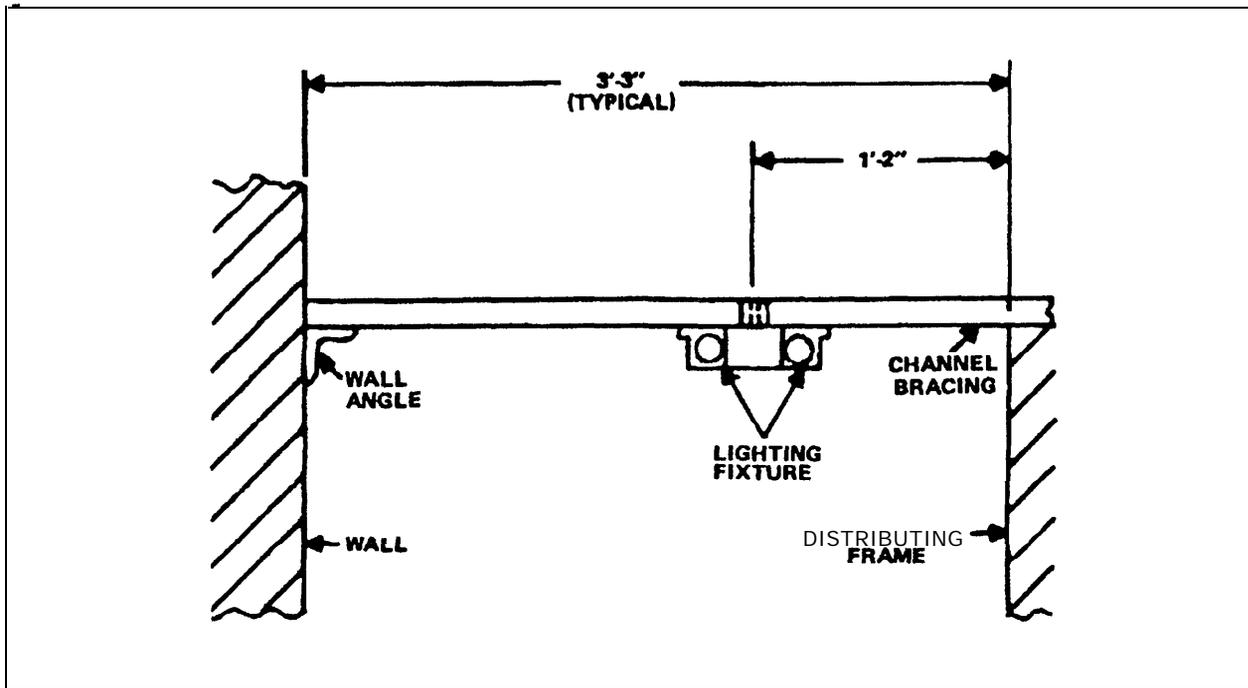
Typical Placement of Lighting Between Wall and Distributing Frame (Without Ladders)
